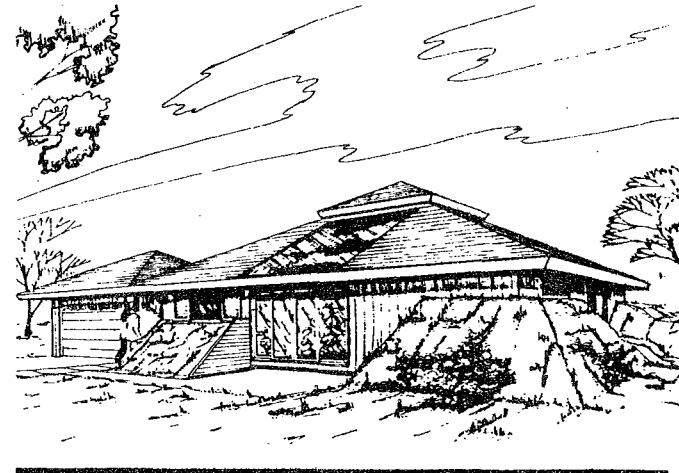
Passive Solar Home. This home utilizes south facing windows to collect daytime solar energy, earth berming around the outside and insulating materials in the roof and walls to cut heat losses, and an atrium and entry lock to keep outside air from coming in contact with inside air at the house entrance.
